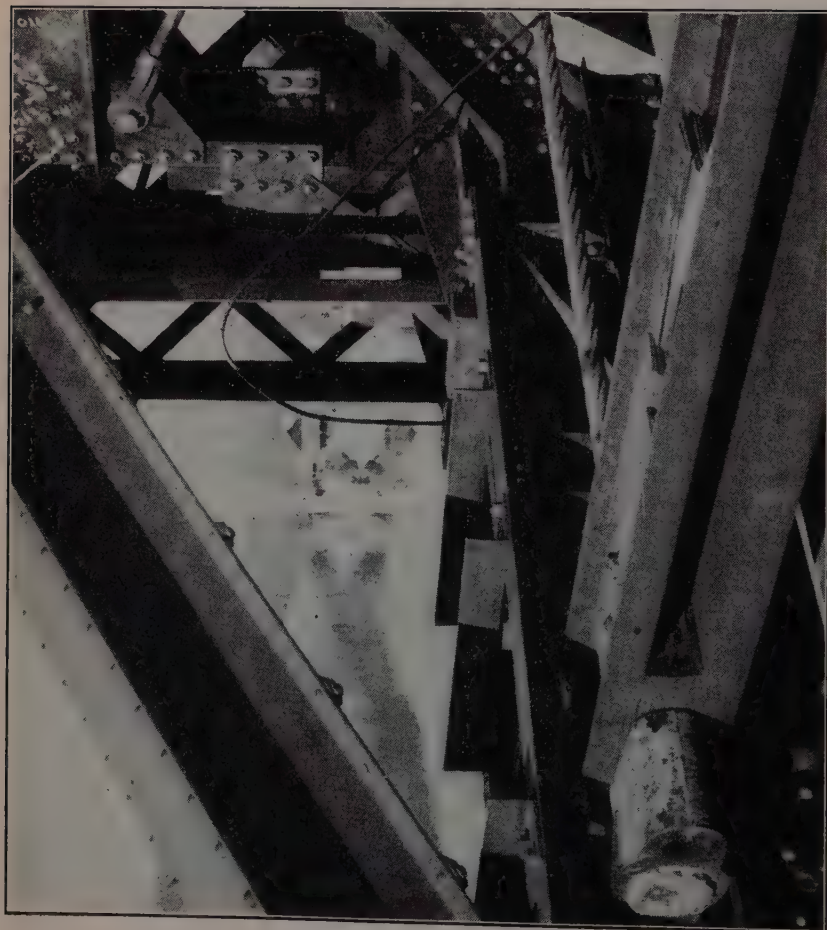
DETAIL VIEW OF THE JACKING DEVICE AND THE ANCHORAGE OF THE CABLES TO THE STABILIZING BEAM
